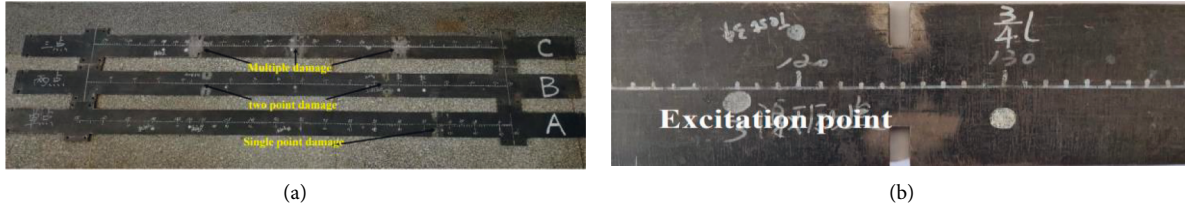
Damage form of steel beam. (a) Steel beam damage case. (b) Steel beam notch form.
